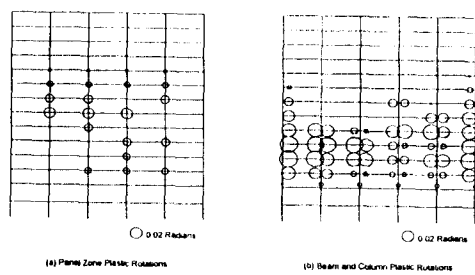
Max. Panel Zone, Beam, and Column Plastic Rotations (Push-over of Repaired Model up to 2% Roof Drift Ratio)
